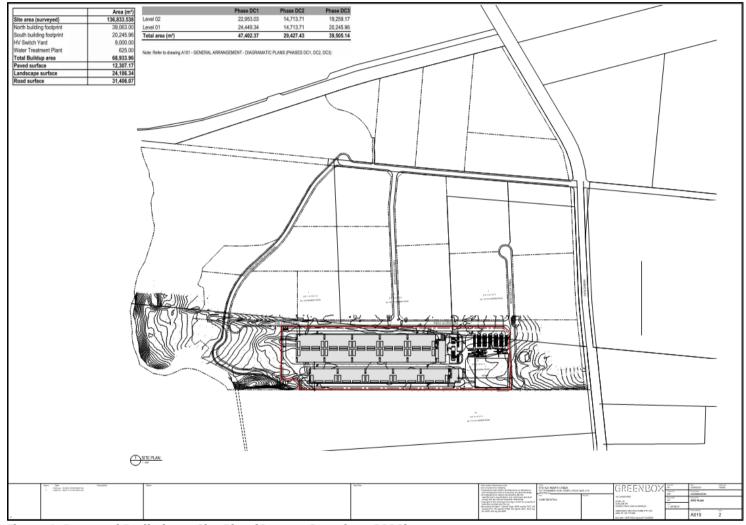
Proposed Preliminary Site Plan (Source: Greenbox, 2020)
